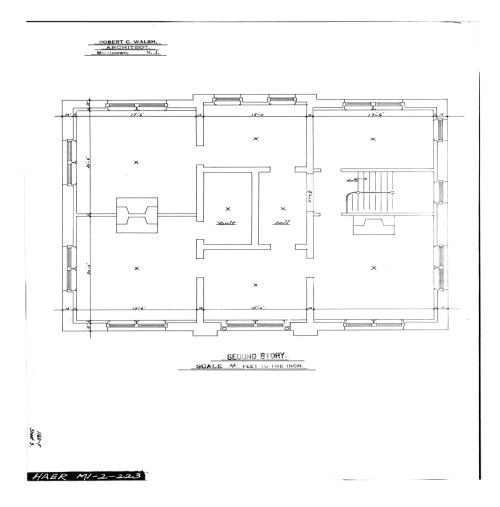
Original second story floor plan of QMC office without labeled rooms. Photograph courtesy of Library of Congress, HAER Documentation, Quincy Mining Company.
